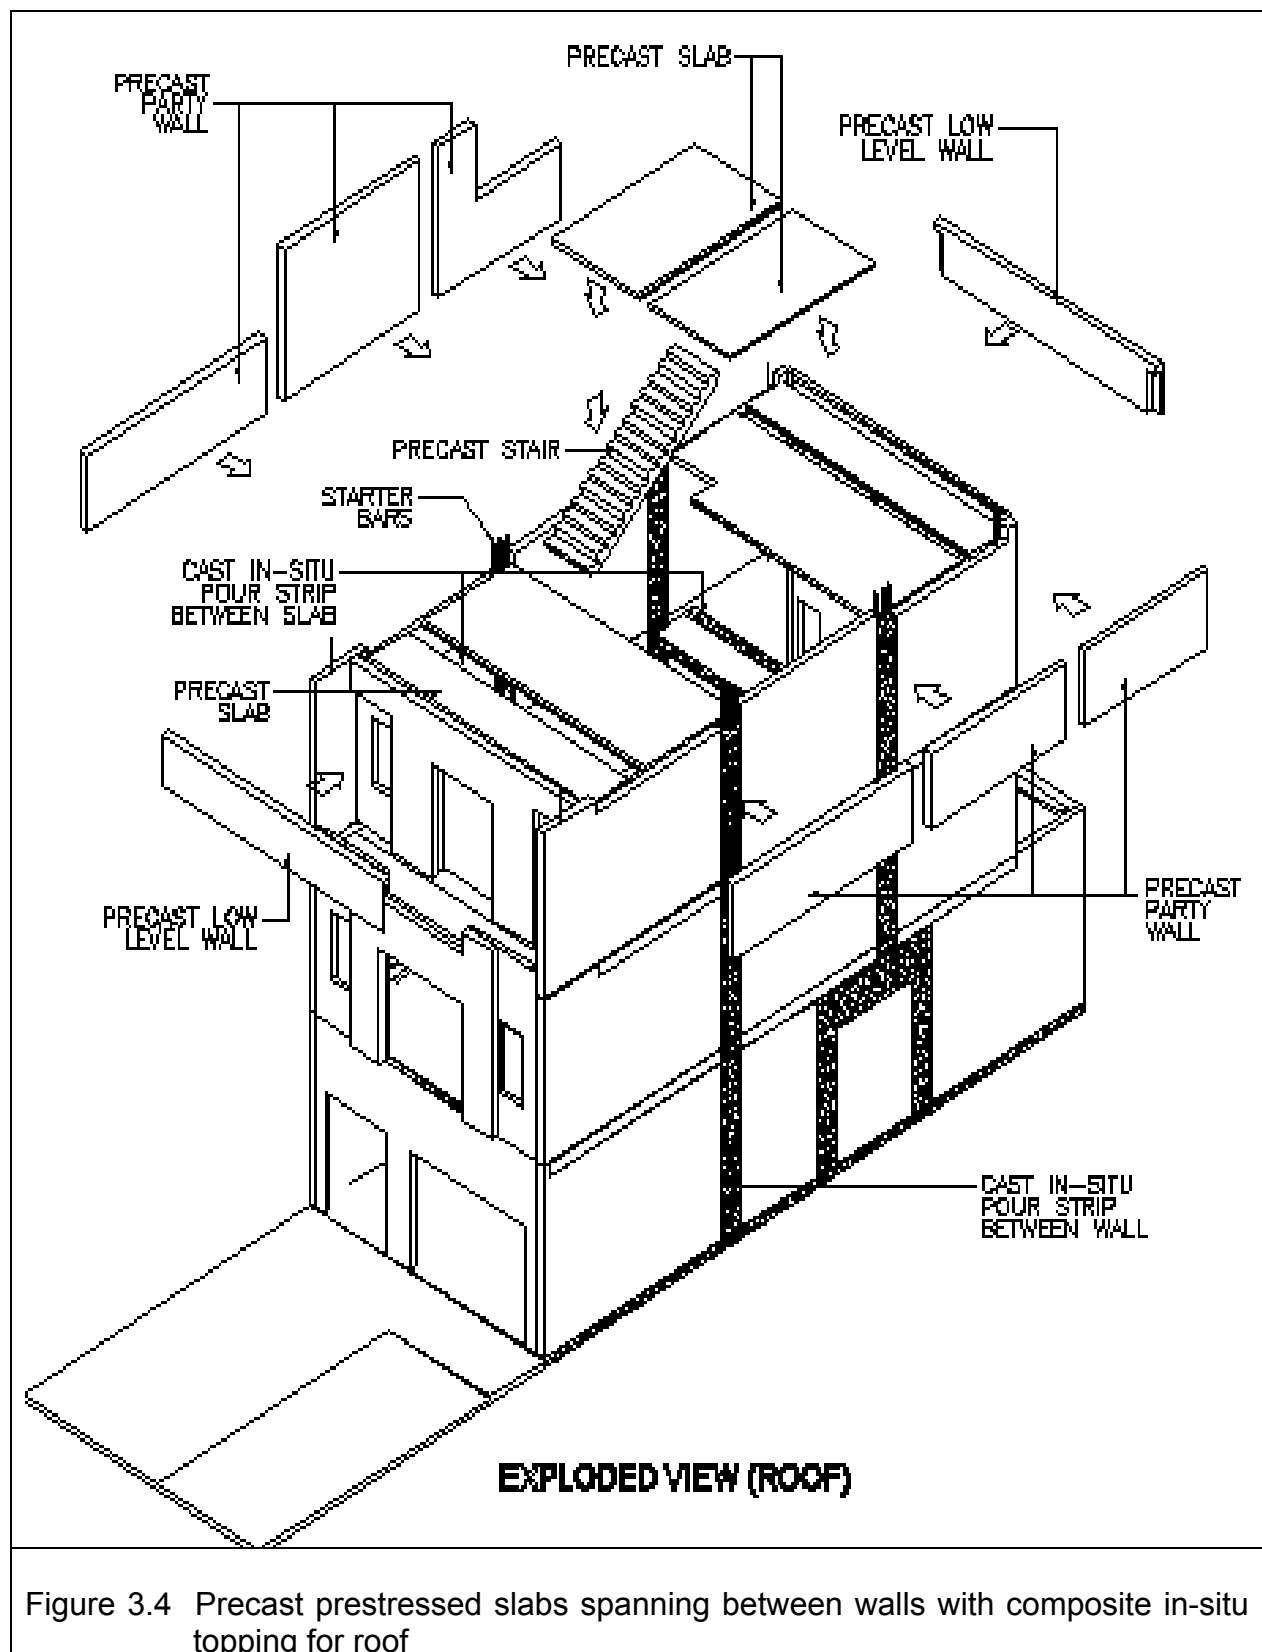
Precast prestressed slabs spanning between walls with composite in-situ topping for roof
